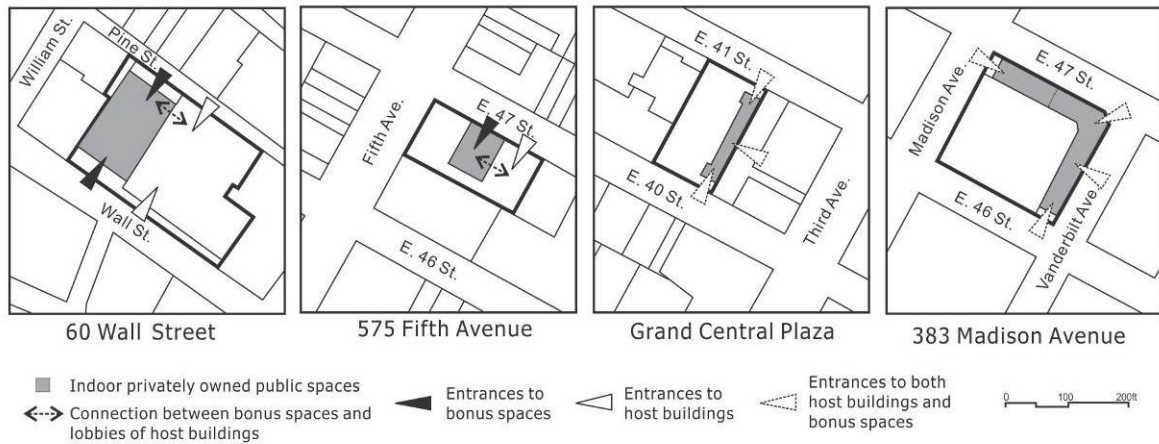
Floor Plans of Four Studied Spaces Indicating Shared Entrances or Separate from Host Buildings
